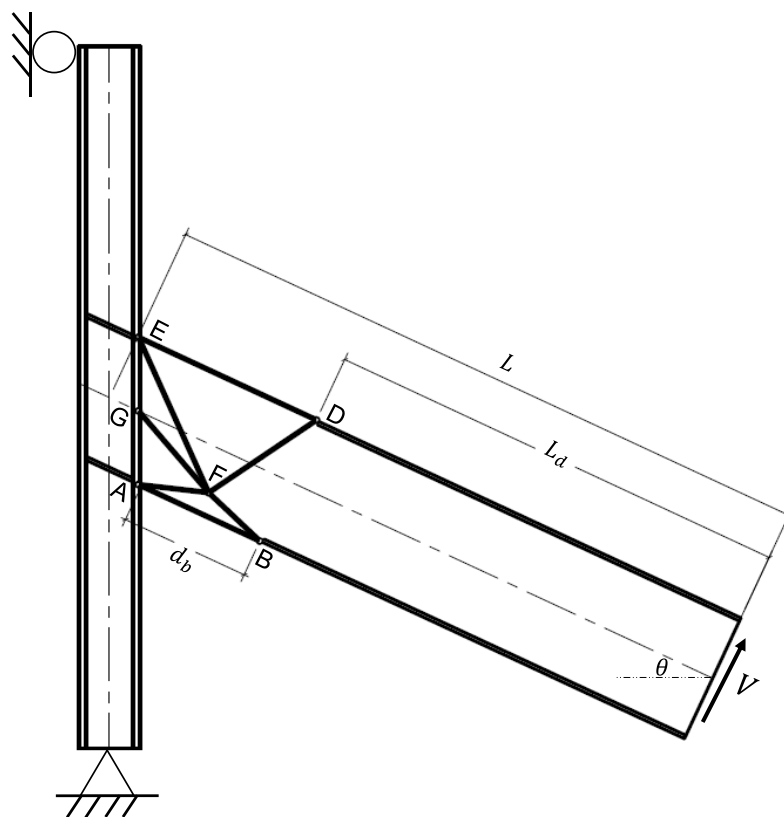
Proposed Truss Model Overlapped on a Sloped Connection
